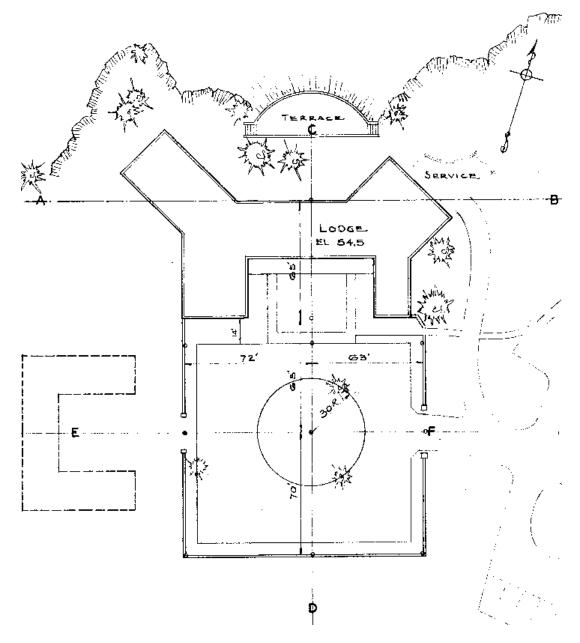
A plan of Conchas Dam Lodge (Conchas Dam Lodge Location Plan 1940).
